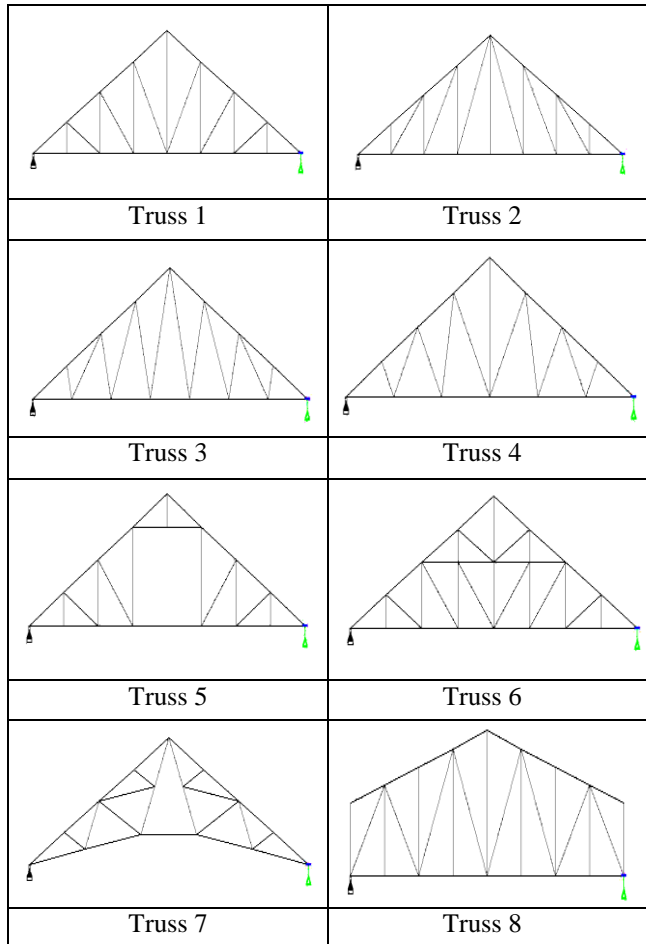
Trusses with constant slopes [Truss 1 to Truss 8]
